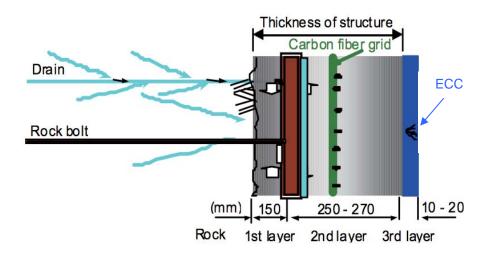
Cross-section of tunnel lining with ECC cover layer for carbonation and spalling protection [17].
